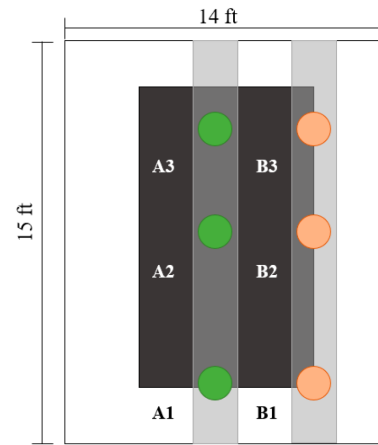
FWD Testing Layout Showing Load Locations Along Two Longitudinal Paths: Slab Center (Path A) and DWPT Edge (Path B).
